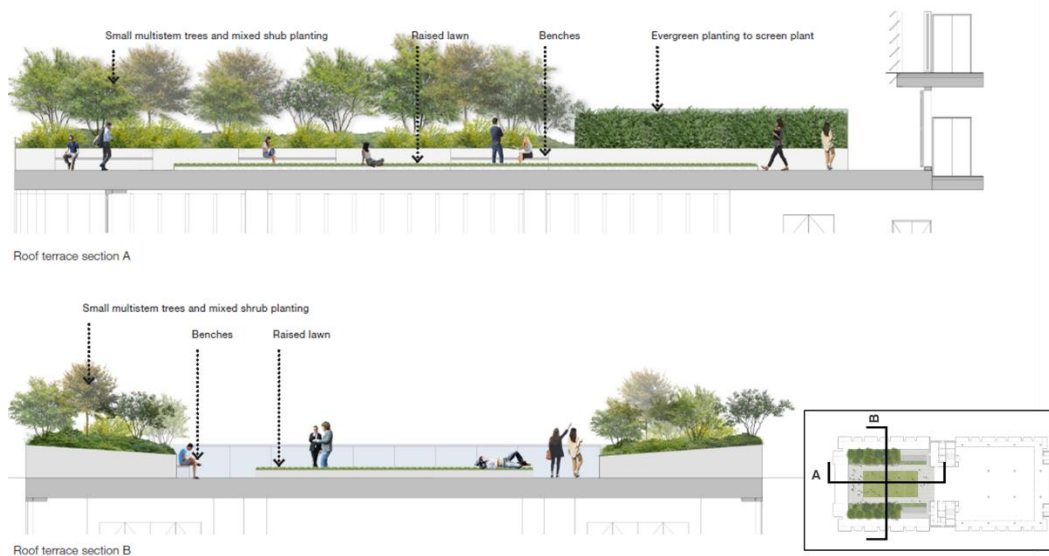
sections through the roof terrace showing the shelter provided by the landscaping and balustrade.
